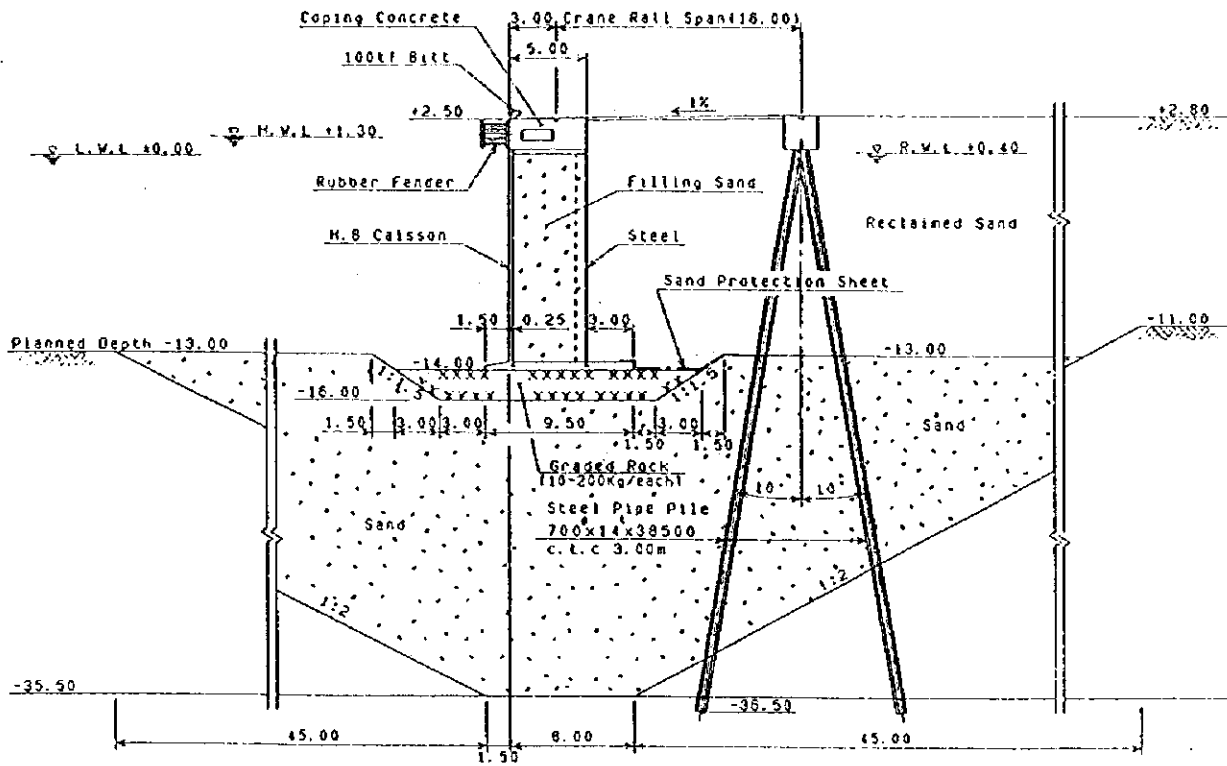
Typical Cross Section of Quaywall W2 in Chan May (Hybrid Caisson)
